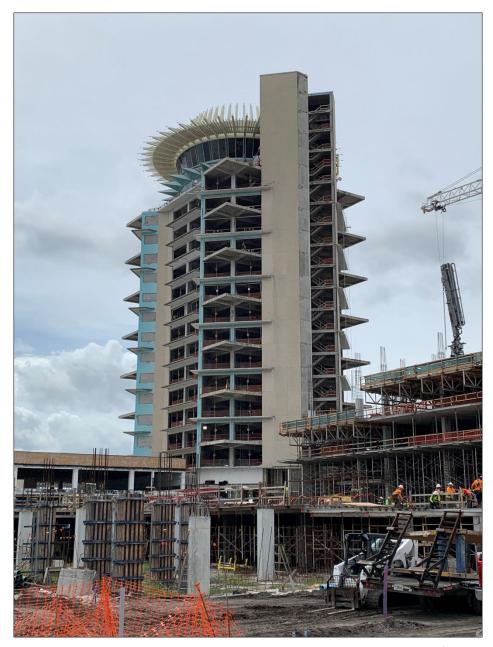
Pier 66 Hotel Tower. Northeast building perspective, camera facing southwest. Photograph taken October 18, 2022.
